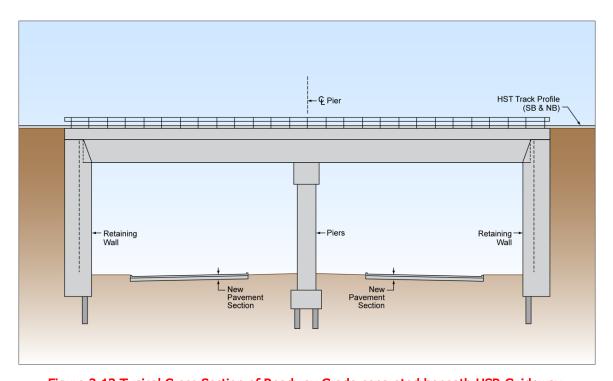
Typical Cross Section of Roadway Grade-separated beneath HSR Guideway
